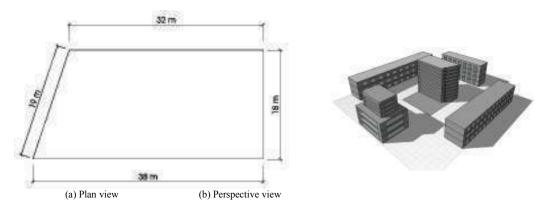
View of building ((a) Plan view; (b) Perspective view)
